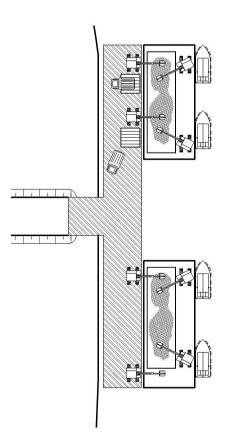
General Plan of Dredged Soil Unloading Pier
